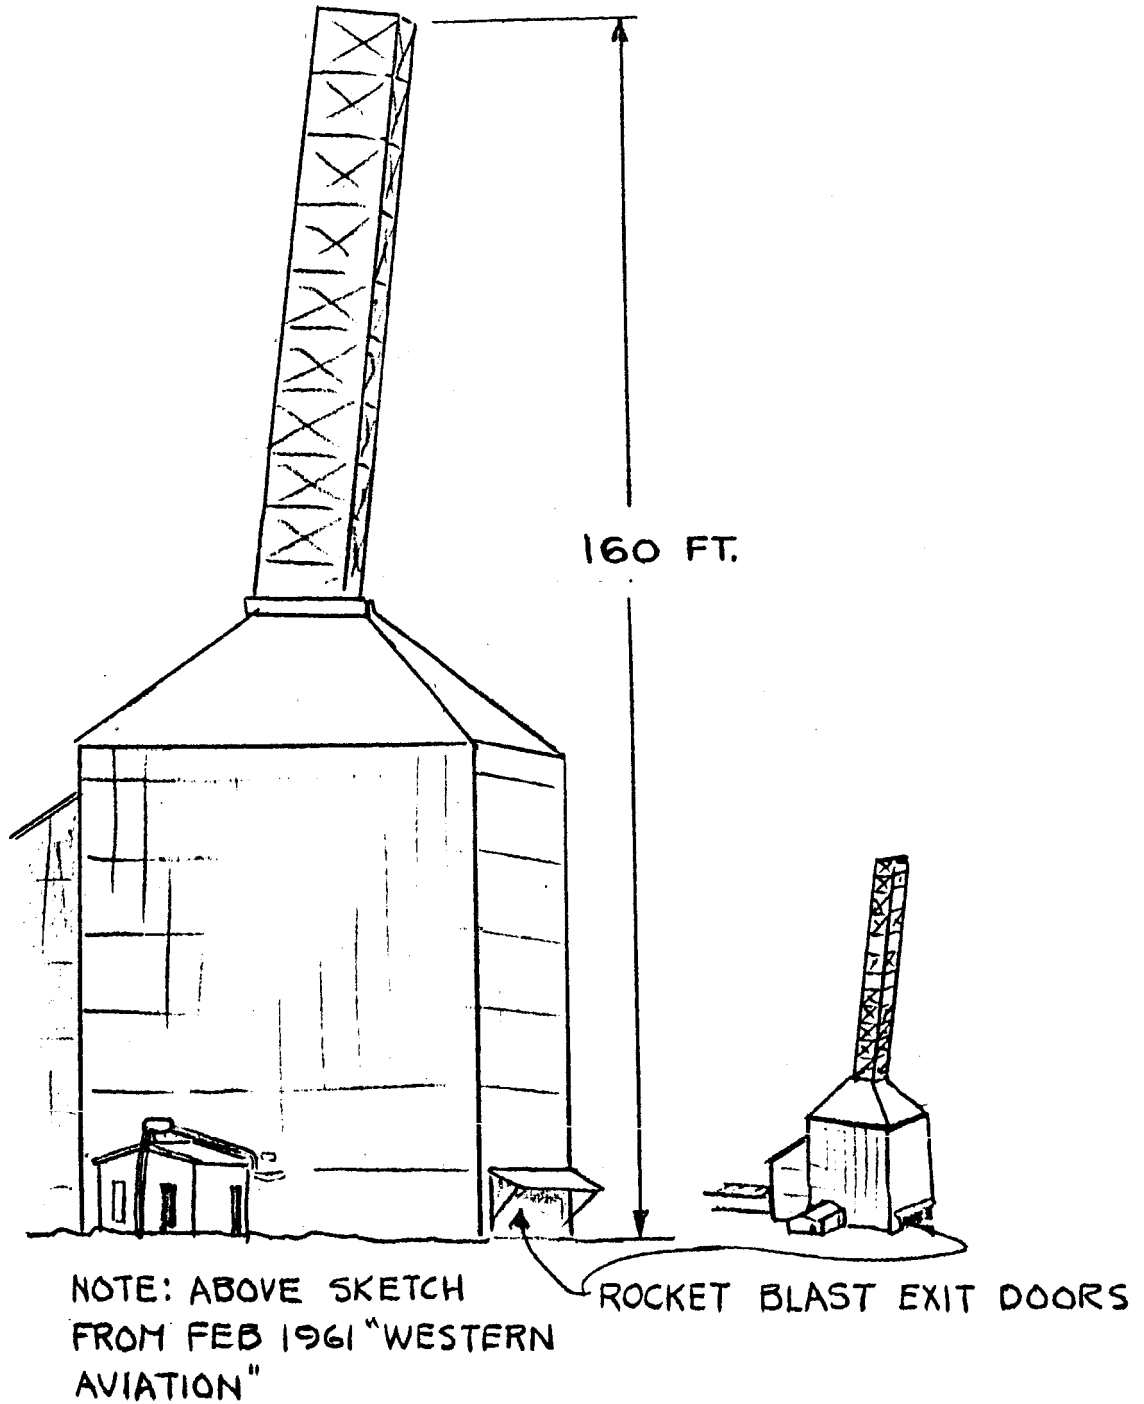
WALLOPS ISLAND LAUNCHING TOWER
